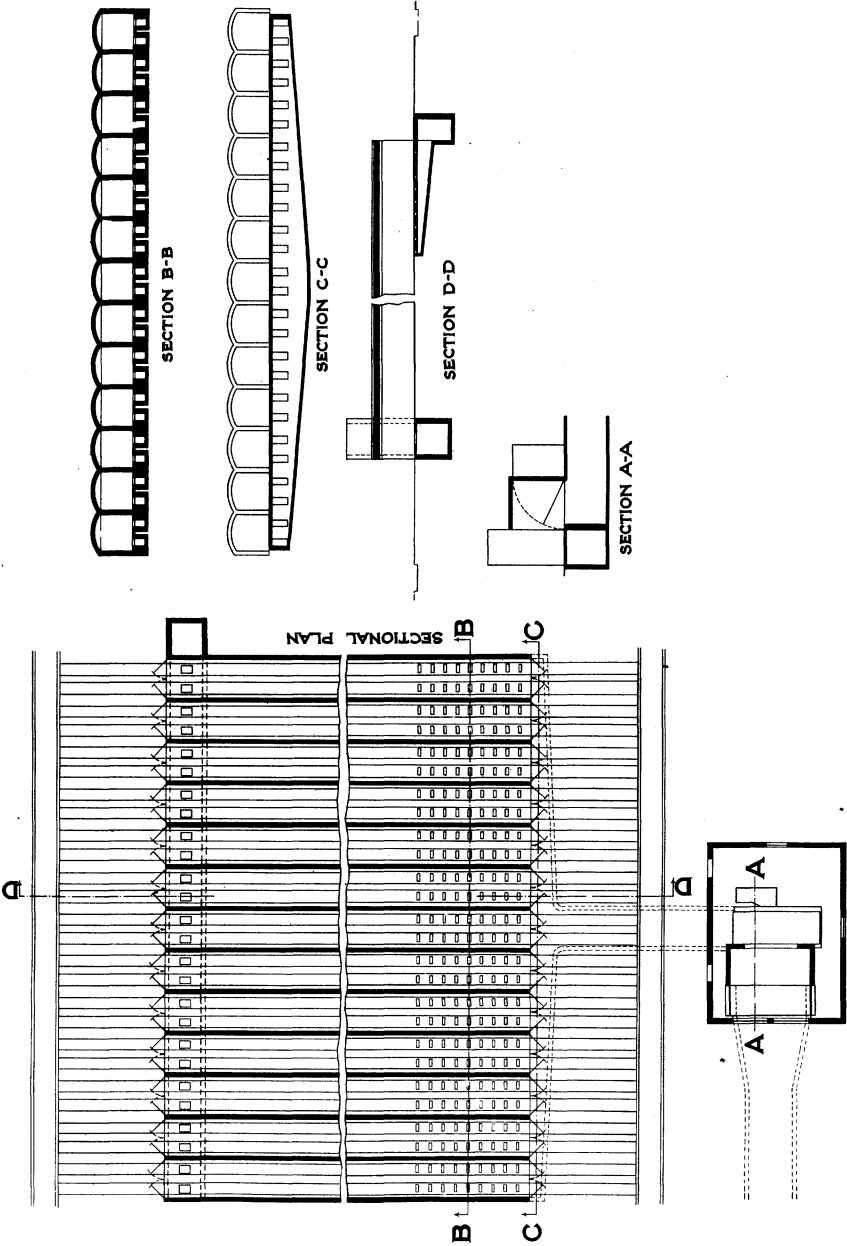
Waste Heat Tunnel Dryer. Ludowici-Celadon Co., New Lexington, Ohio.
